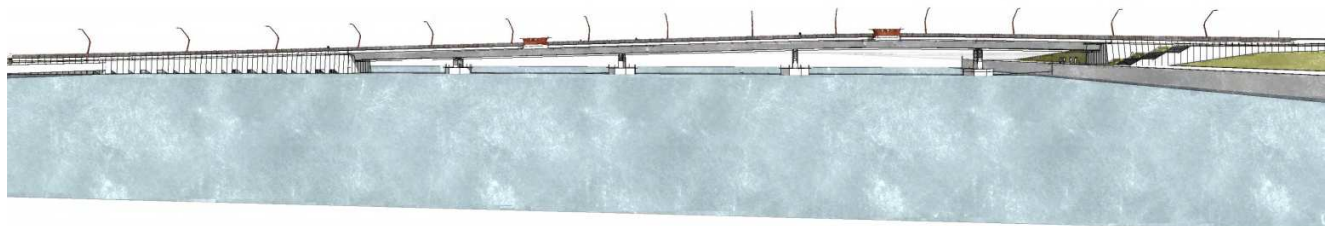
Homebush Bay Bridge – Elevation - view looking south (Source: Response to submissions 2013)
